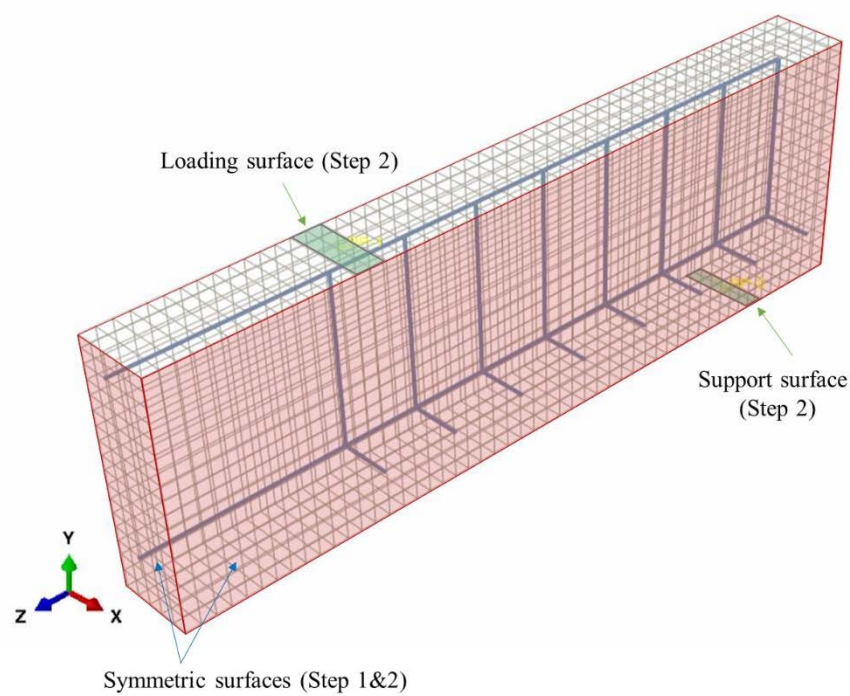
Geometry and boundary conditions of the reinforced concrete tested in Fan & Hanson (1998).
